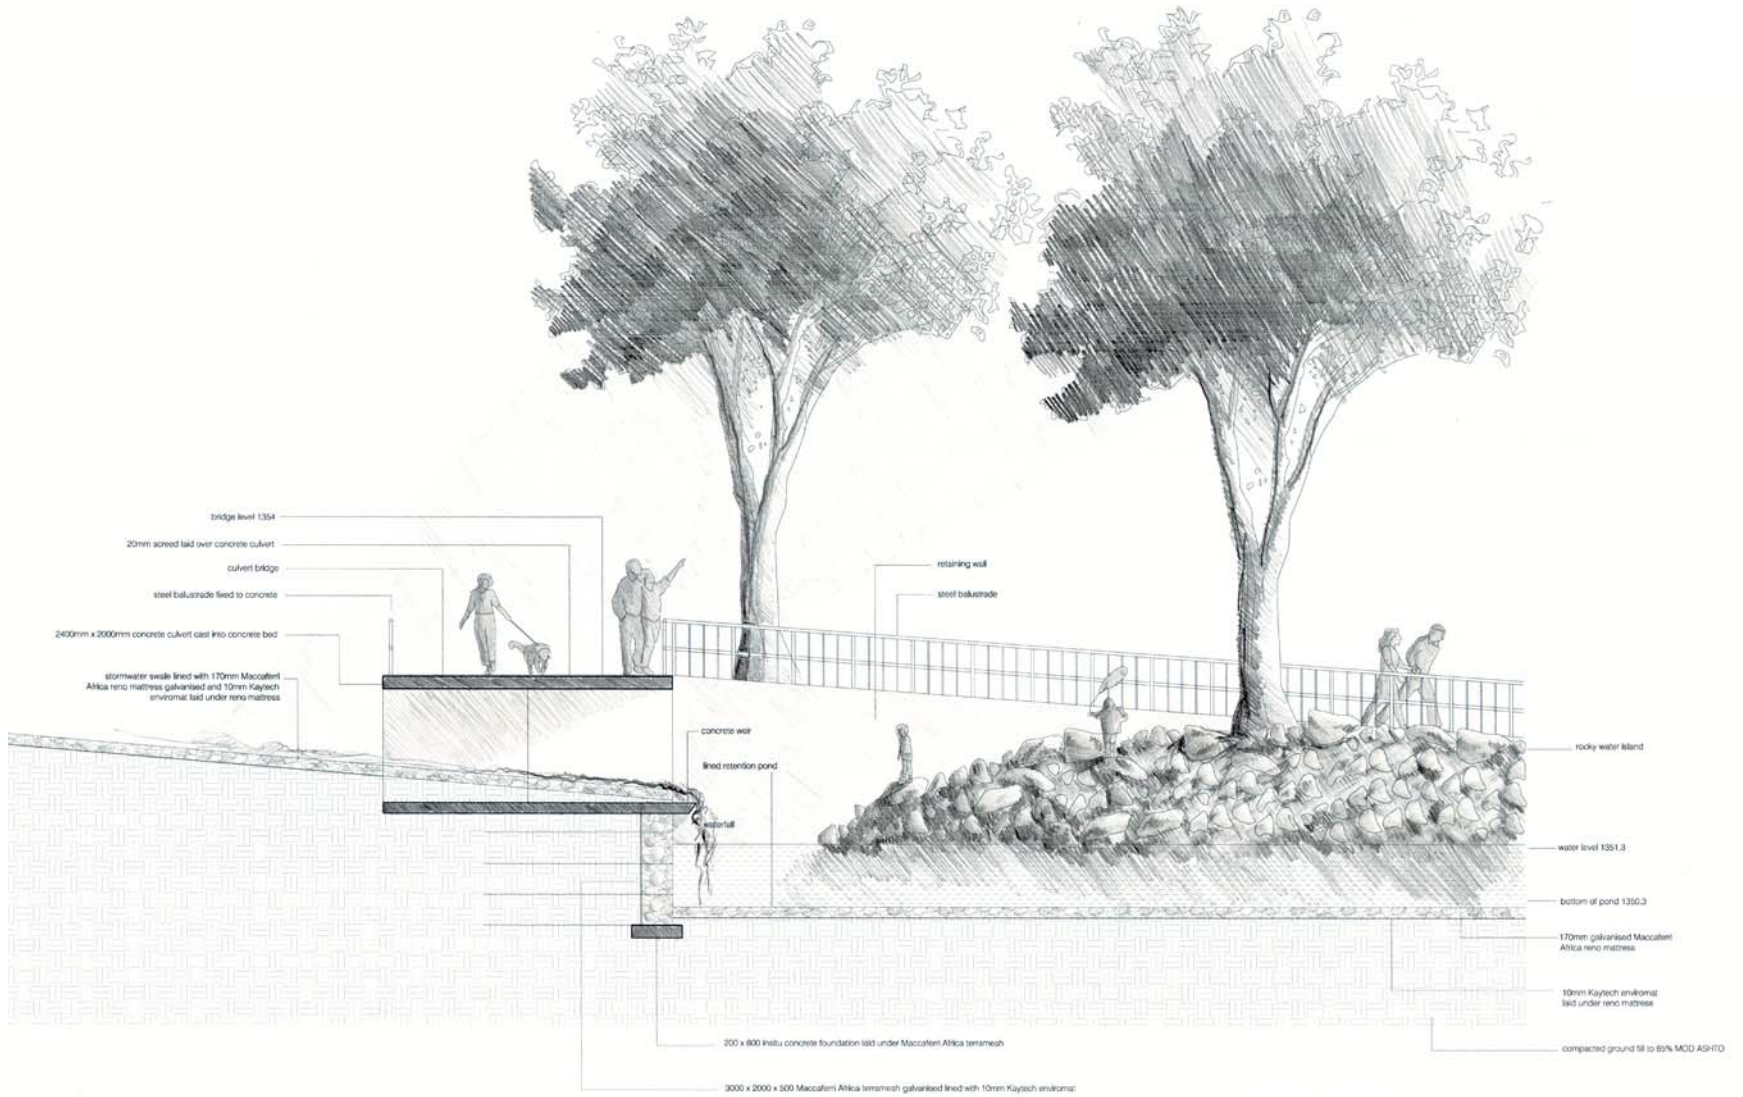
Waterfall bridge. Section elevation E. Not to scale
